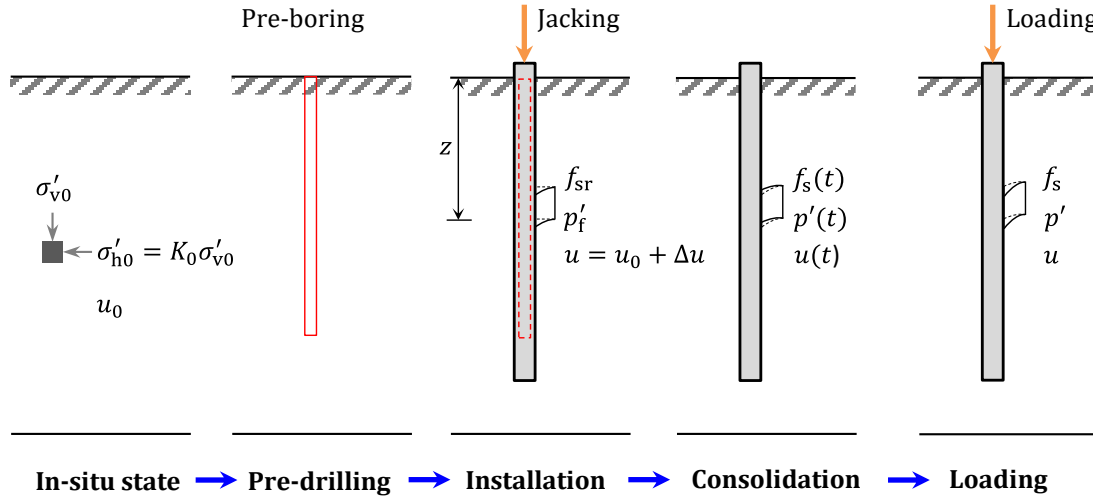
illustrates the various stages typically encountered in the installation and loading of a pre-bored pile, which consists of pre-boring, pile installation, consolidation, and loading. As seen in the figure, the foundation is K_0 -consolidated with in-situ static pore water pressure u_0 . The in situ horizontal effective stress σ'_{h0} equals to the product of in situ vertical effective σ'_{v0} and coefficient of earth pressure at rest K_0 . Before pile installation, a pilot hole, the radius of which is smaller than the radius of the pile, is first drilled to the prescribed depth. As a first approximation, it is assumed that the unloading during pre-drilling is an elastic process and the stress state can be fully recovered when the wall of the hole expands to the initial location during pile installation. Hence, the stability of the pre-bored hole itself is not an issue and the contraction of the pre-drilled hole and the change of the stress state during pre-boring phase are ignored in this study. After pre-boring the hole, the displacement pile is installed in the pre-drilled hole with the radius of the hole expanding from the initial radius $a_{p,pre}$ to the pile radius a_p as the pile tip pushes the wall of the pre-drilled hole away from the path of the pile. During this stage, the soil surrounding the pile is severely squeezed and sheared to the residual state with residual shaft resistance equal to f_{sr} . Due to the squeezing and shearing effects, excess pore water pressure Δu is generated in the soil adjacent to the pile, which results
